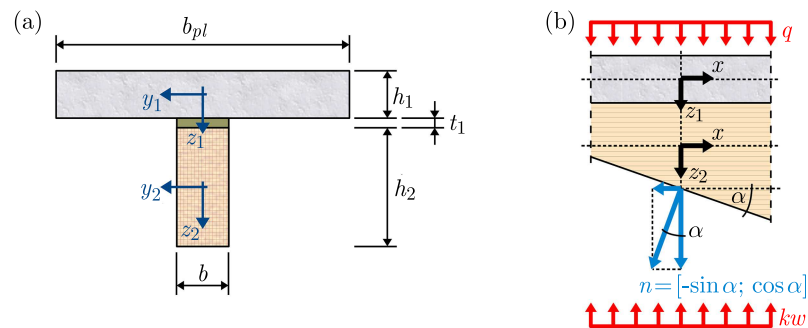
a) Cross-section of the considered composite timber – concrete beam; b) Static boundary condition on the bottom face of the bottom beam
